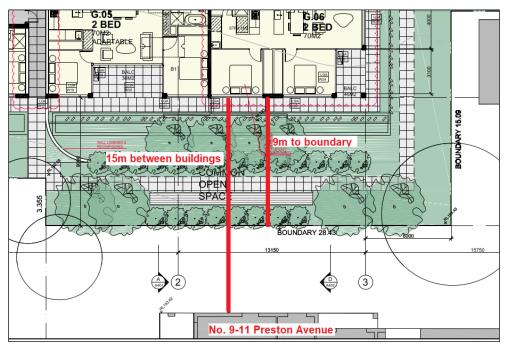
Setback and separation distances between Building 'A' and No. 9-11 Preston Avenue.
